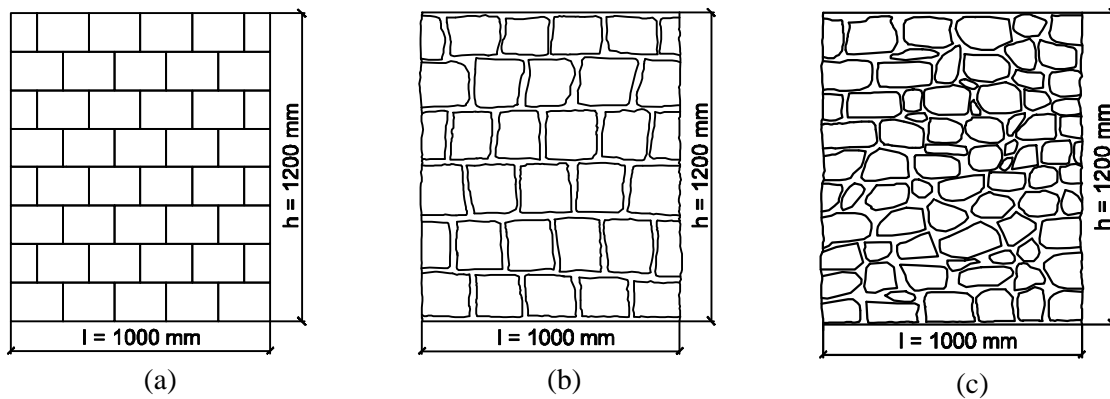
Geometry and bond details of the walls; (a) sawn stone units walls, WS; (b) irregular walls, WI; (c) rubble walls, WR
